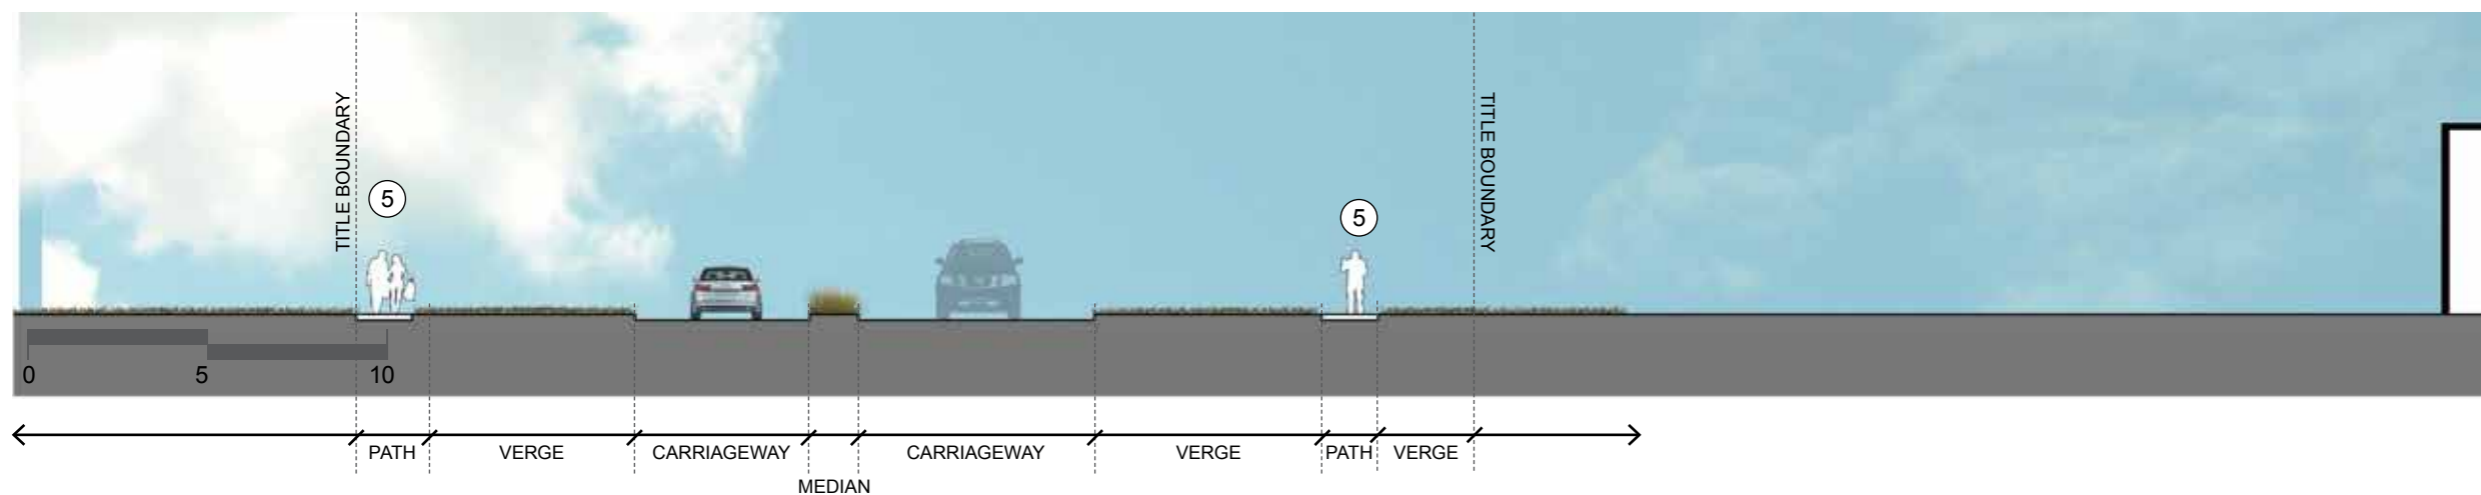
Kinglake proposed streetscape section (CC)
